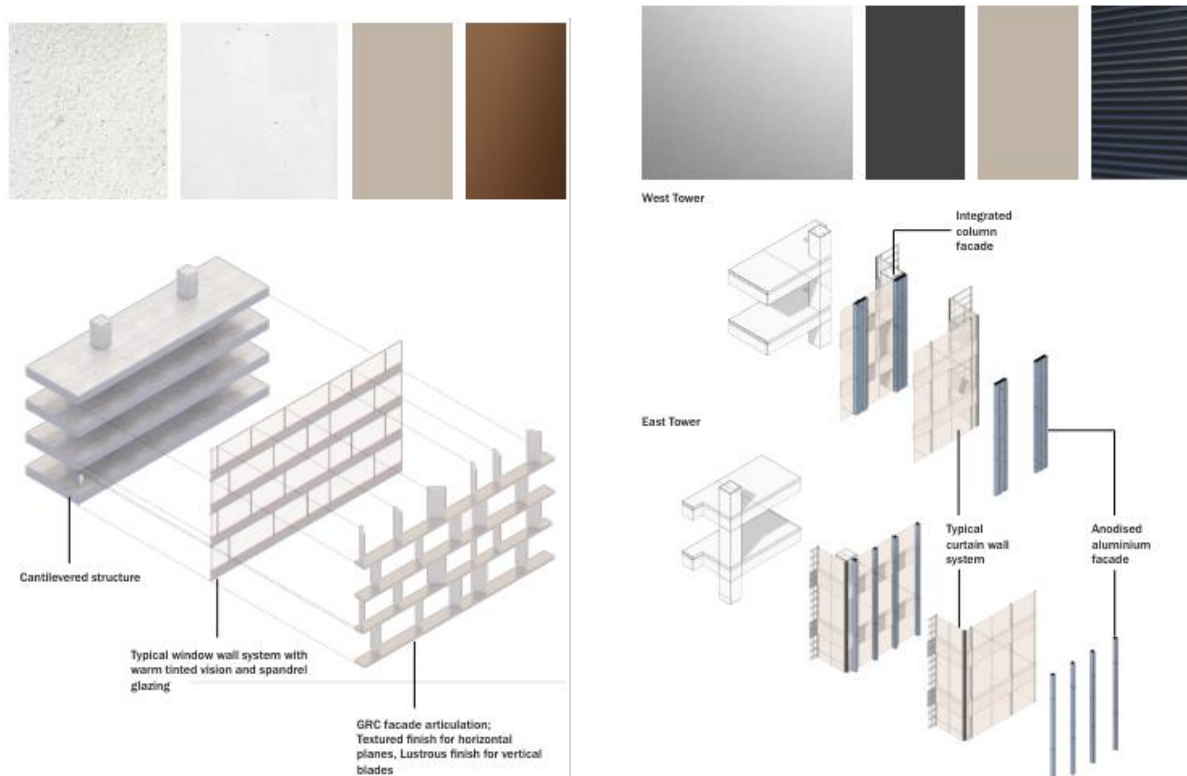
& 23 – Details of podium and tower facades (Source: Hassell Architects)
